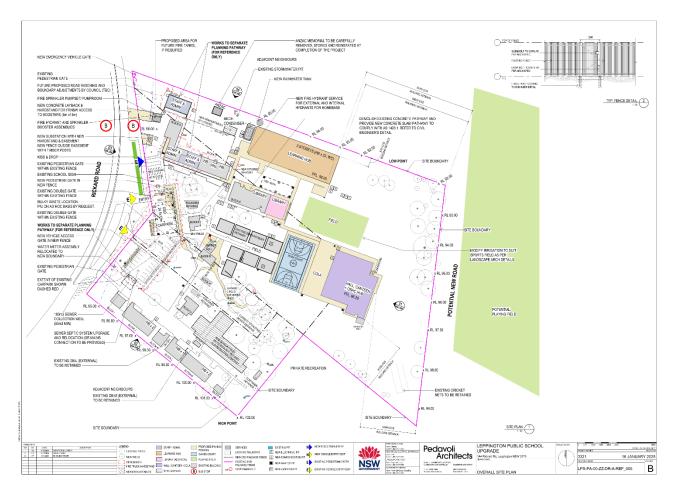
Proposed Activity (Source: Pedavoli Architects, Overall Site Plan (Rev B))
